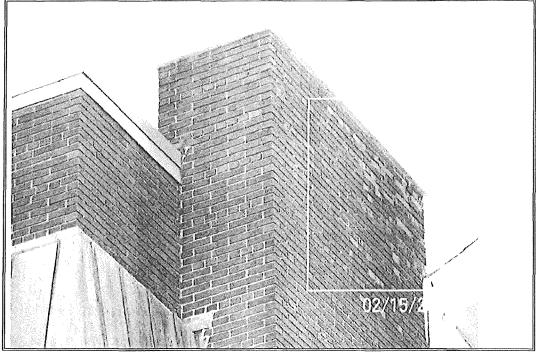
Photograph Number 6: Penthouse west wall of sheet metal siding, and brick veneer walls on the north, south and east elevations.
